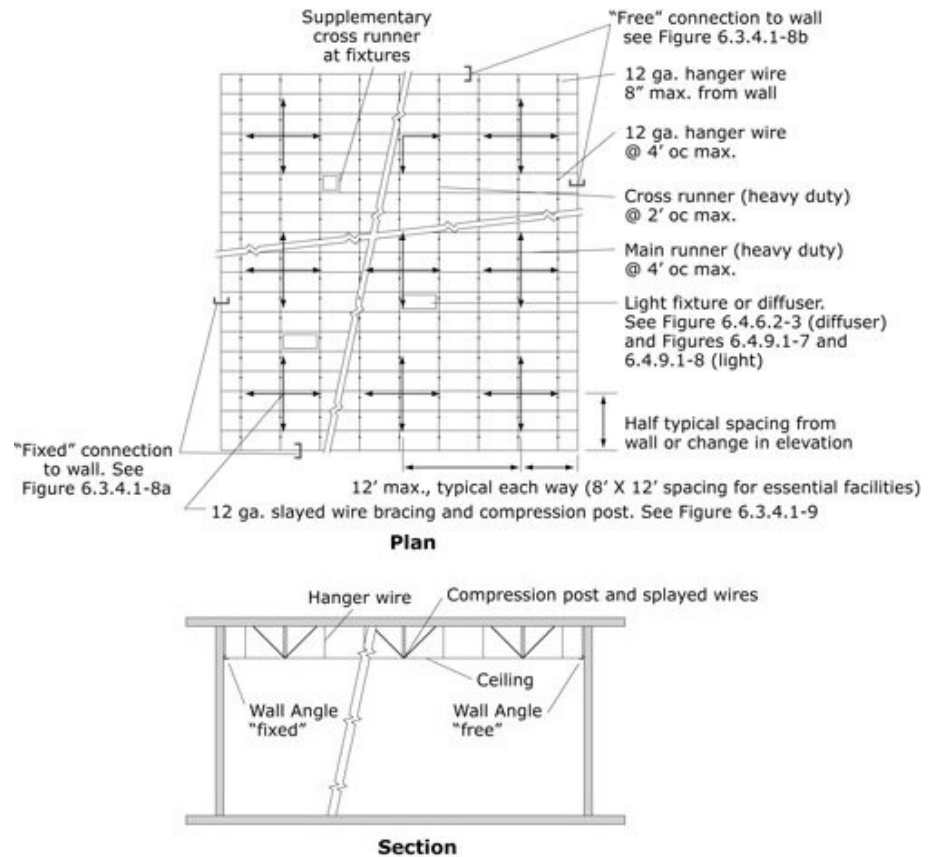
General layout of the seismic bracings for suspended acoustic lay-in tile ceilings (FEMA, 2011)
